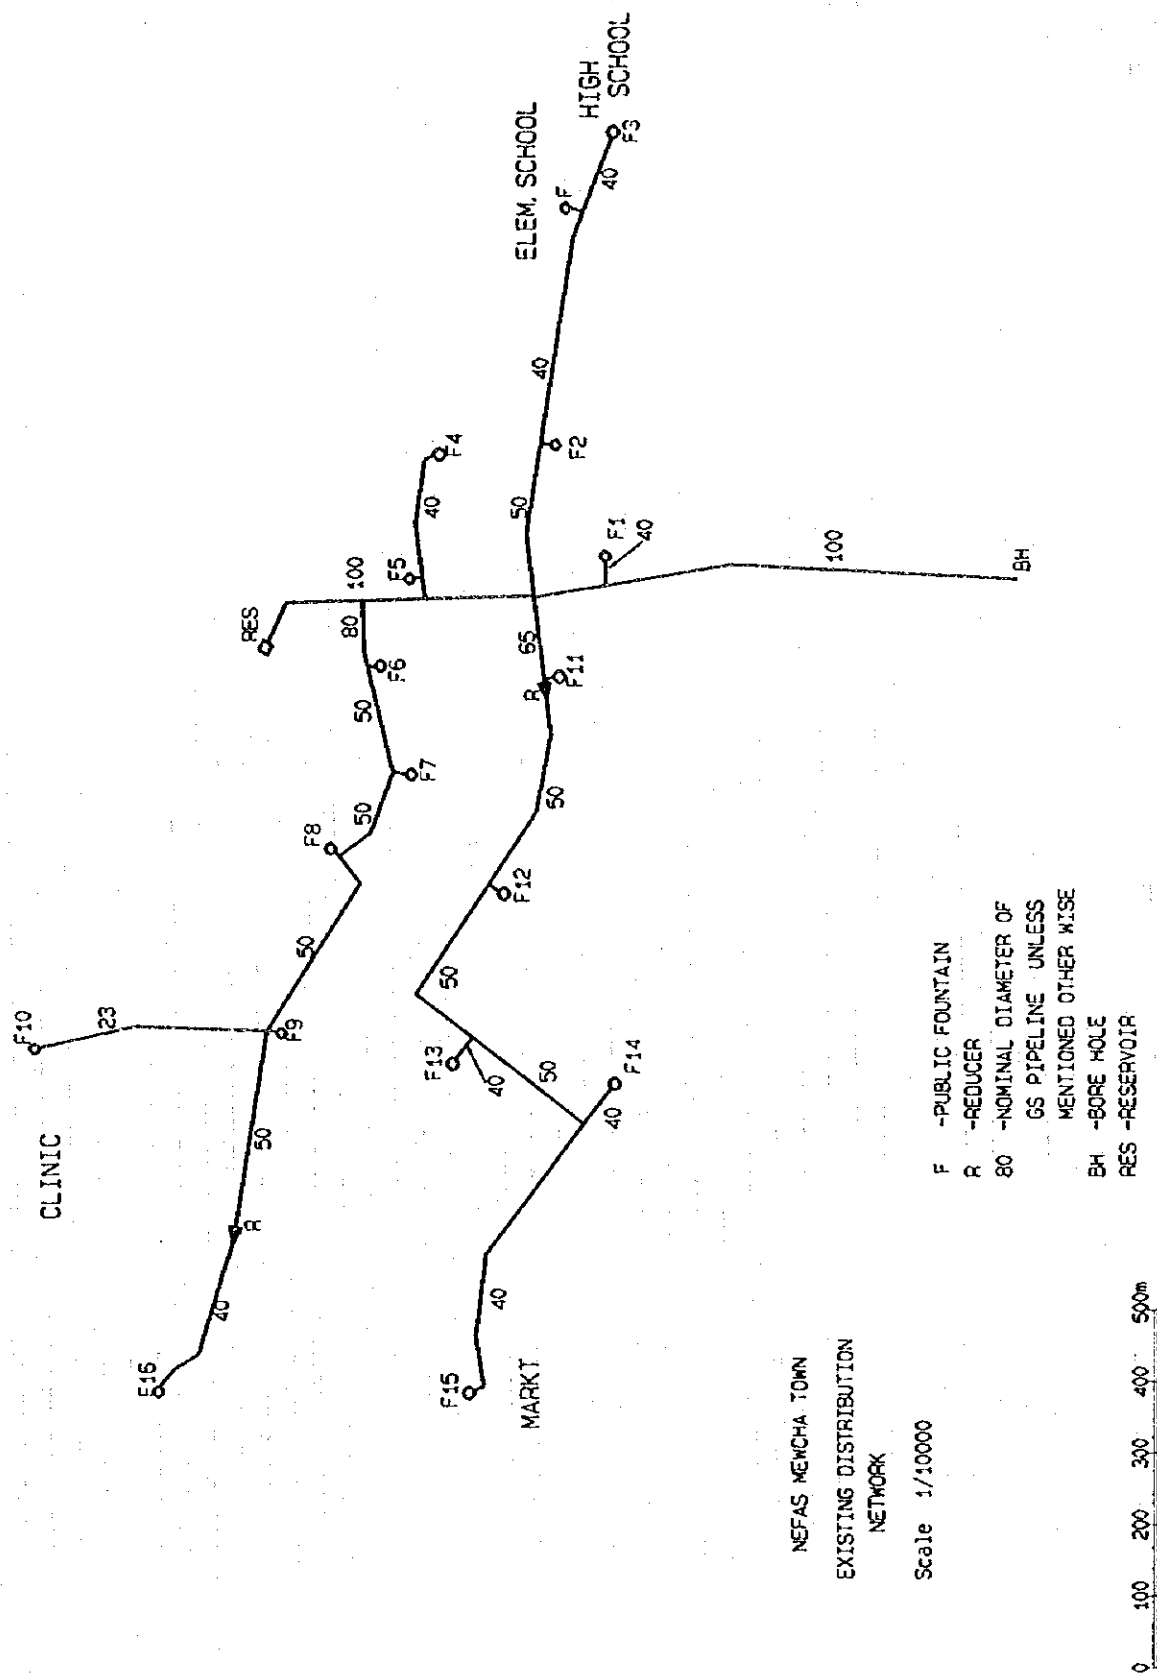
Schematic layout of Existing Facilities (No scale)
